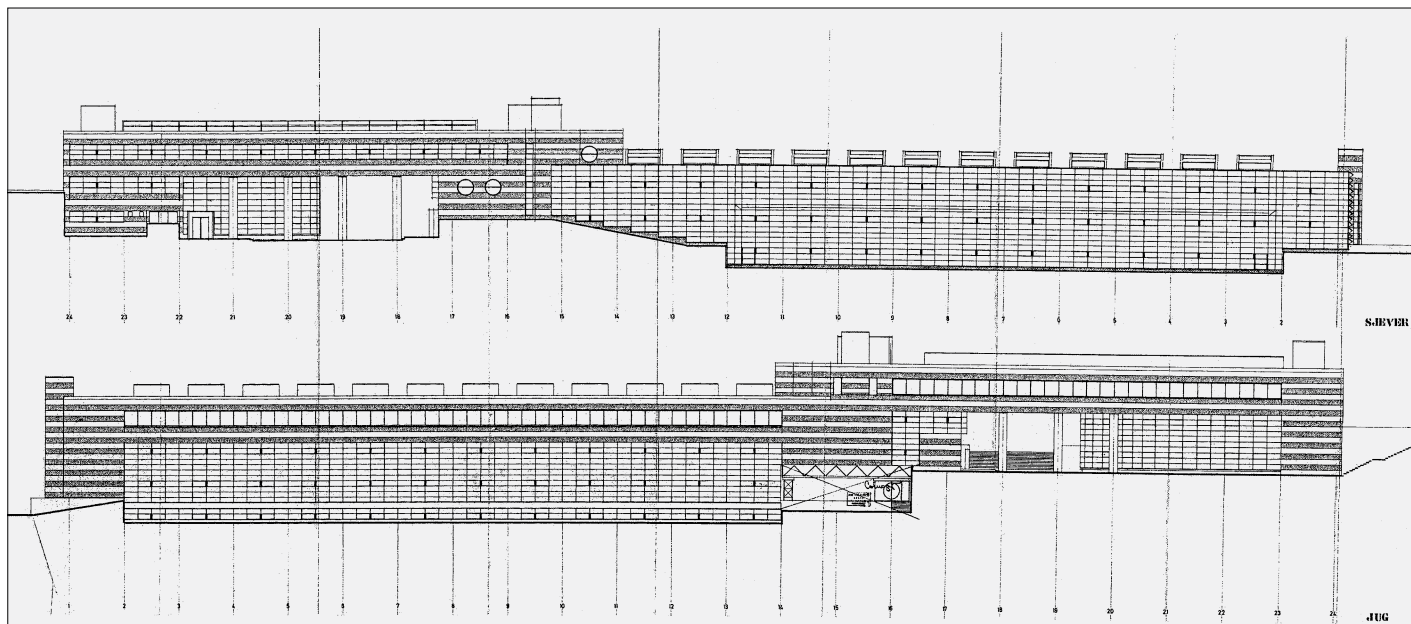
NORTH AND SOUTH FAÇADES OF THE BRODOMERKUR OFFICE BUILDING, AUTHOR DANKO COLNAGO
